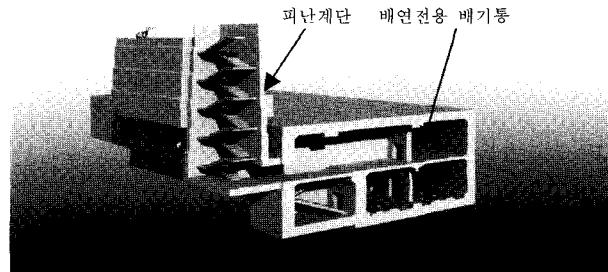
Concept drawing showing egress only stair near air tower at the center of tunnel
